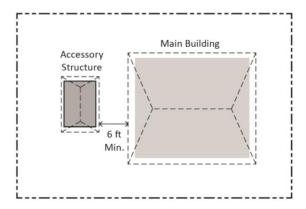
F: ACCESSORY STRUCTURE SEPARATION FROM MAIN BUILDING
